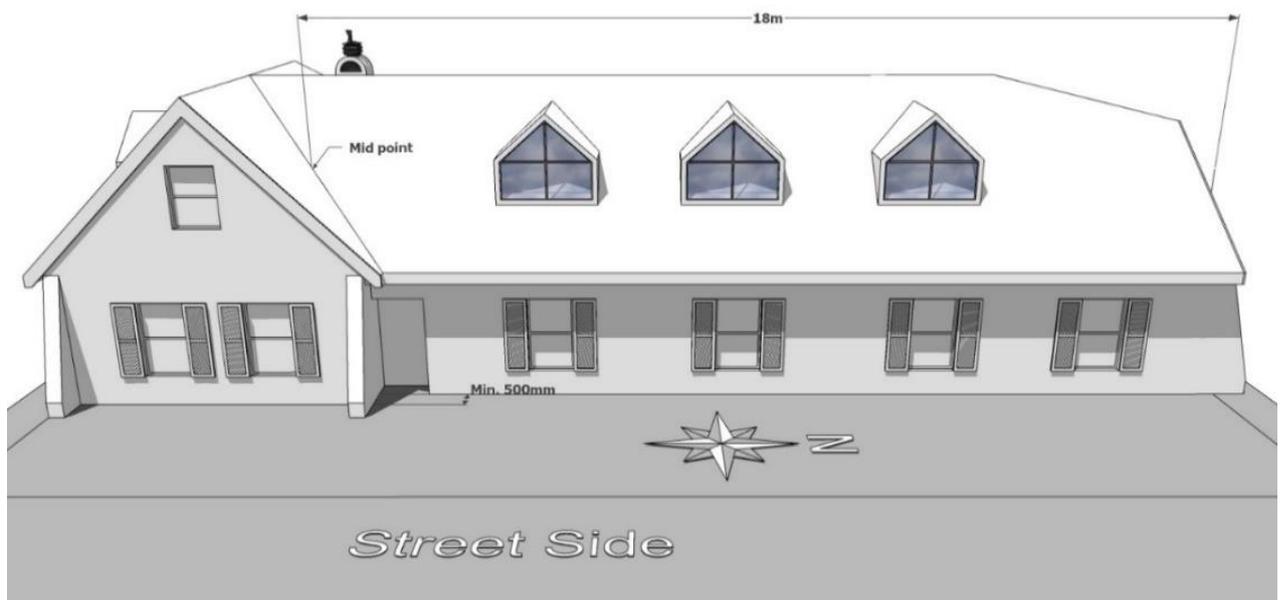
Single house roof length limit, parallel to the street with projecting wing.
